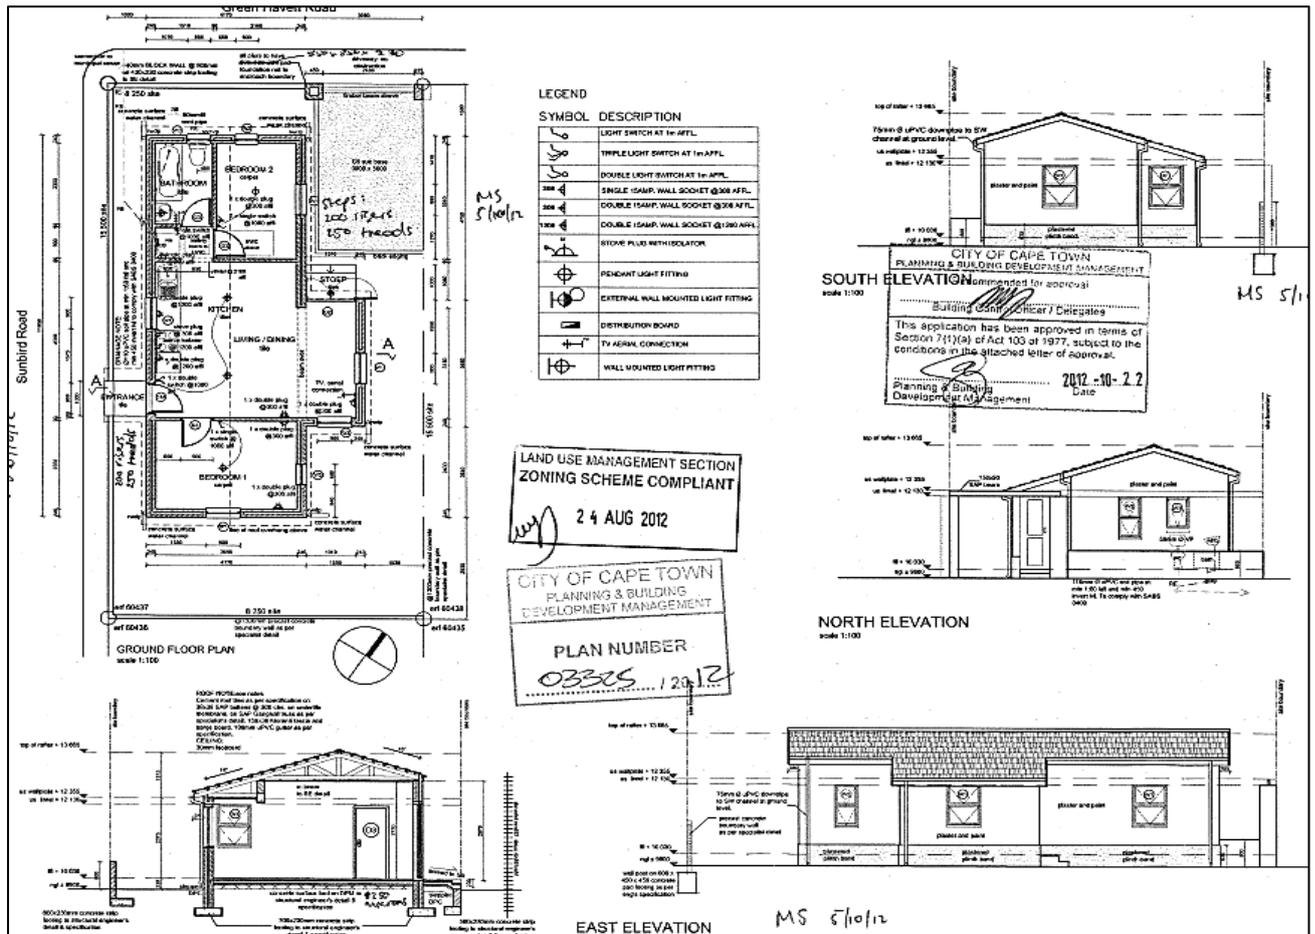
Building plan of a West Cape Villas dwelling unit
